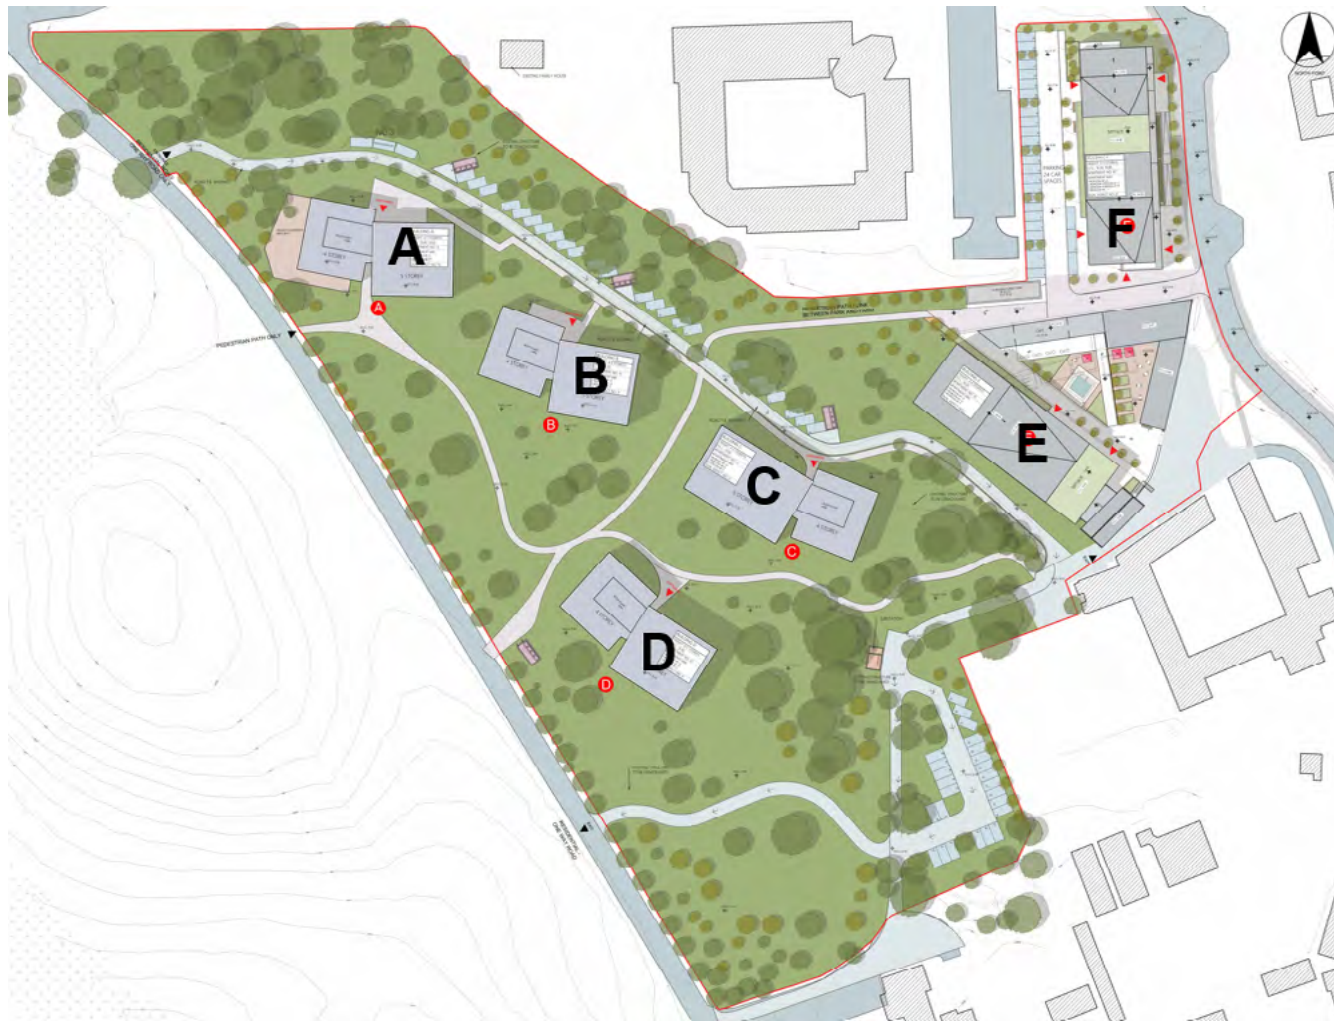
The Farm – Alternative A – Site layout plan – S247 Meeting stage
